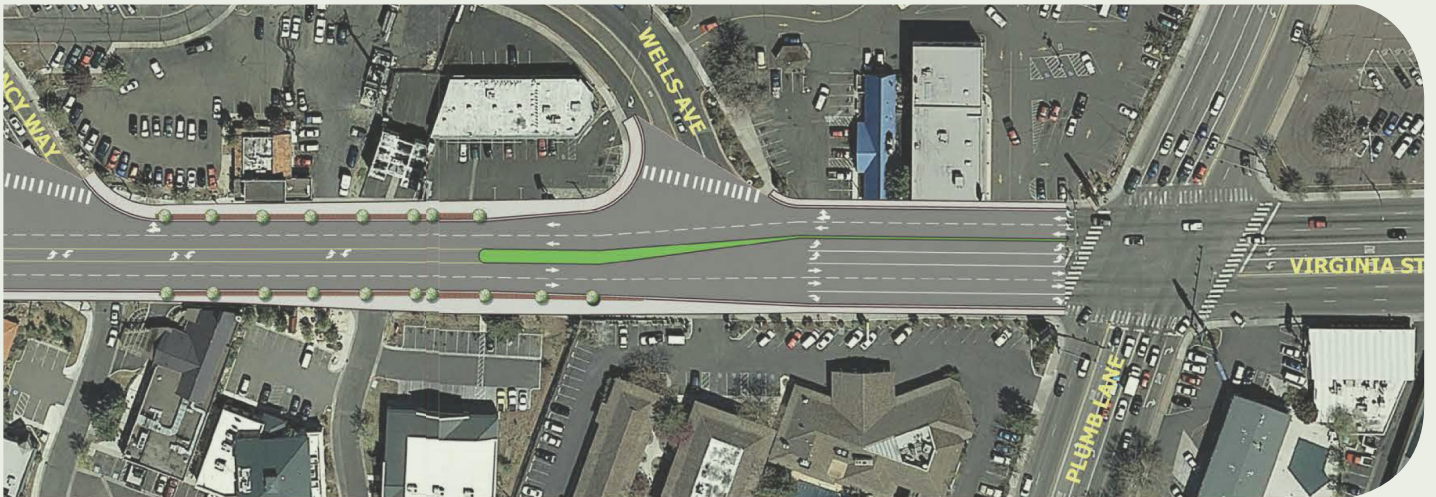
Plan view of Virginia Street Concept in Midtown (preliminary concept - subject to change)
